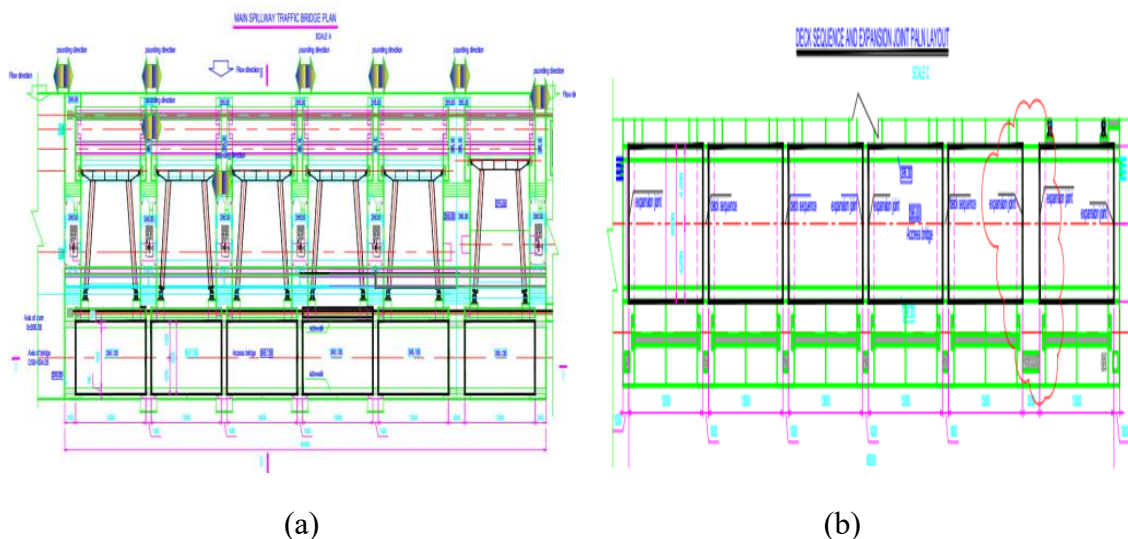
Layout of the main spillway and flushing sluice including girder vibration scheme and expansion joint arrangement.
